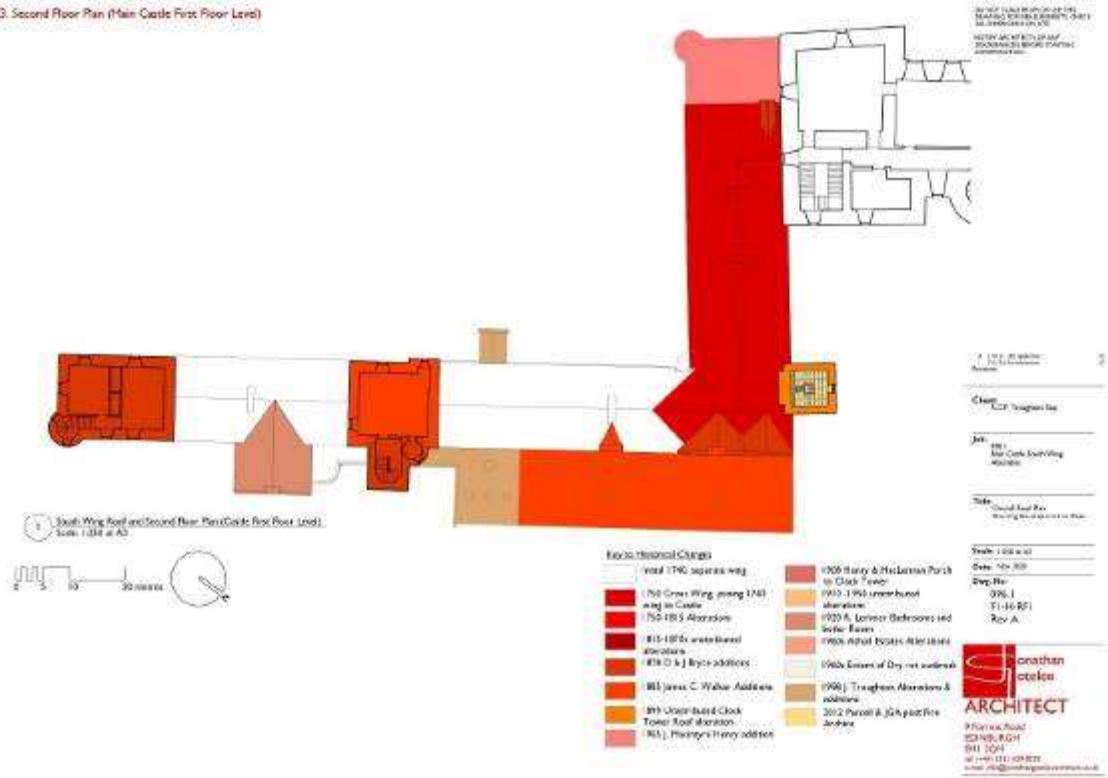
Representation of the areas altered & when they were made. Second Floor Plan (Main Castle First Floor Level).
